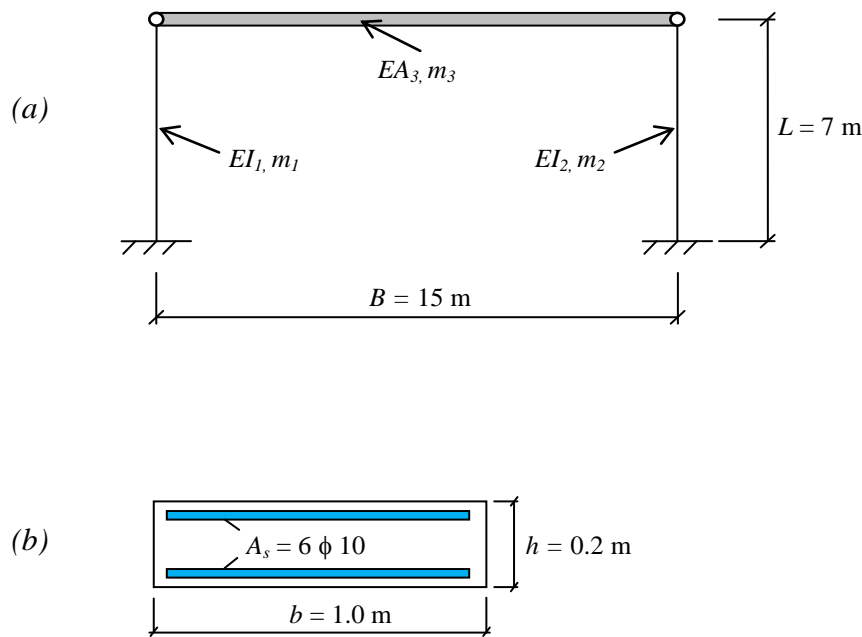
(a) Dimensions of the studied frame. (b) Dimensions of the considered cross section for the wall and for the roof beam.
